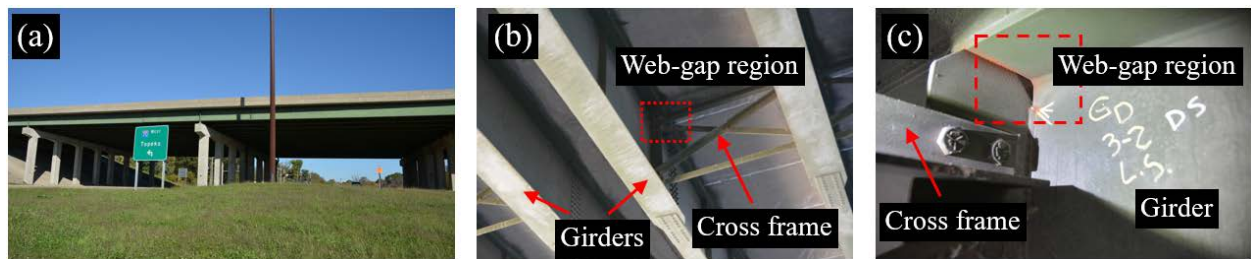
(a) Test Bed Bridge in the Field; (b) Typical Cross Frame and Longitudinal Girders; (c) Web-Gap Region Between the Cross Frame and the Girder
